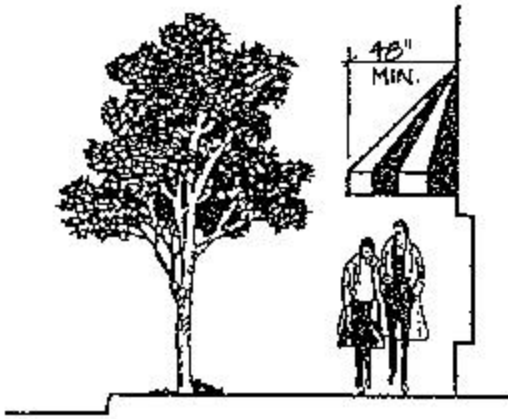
E – Pedestrian weather protection shall extend at least four (4) feet from the building façade.
